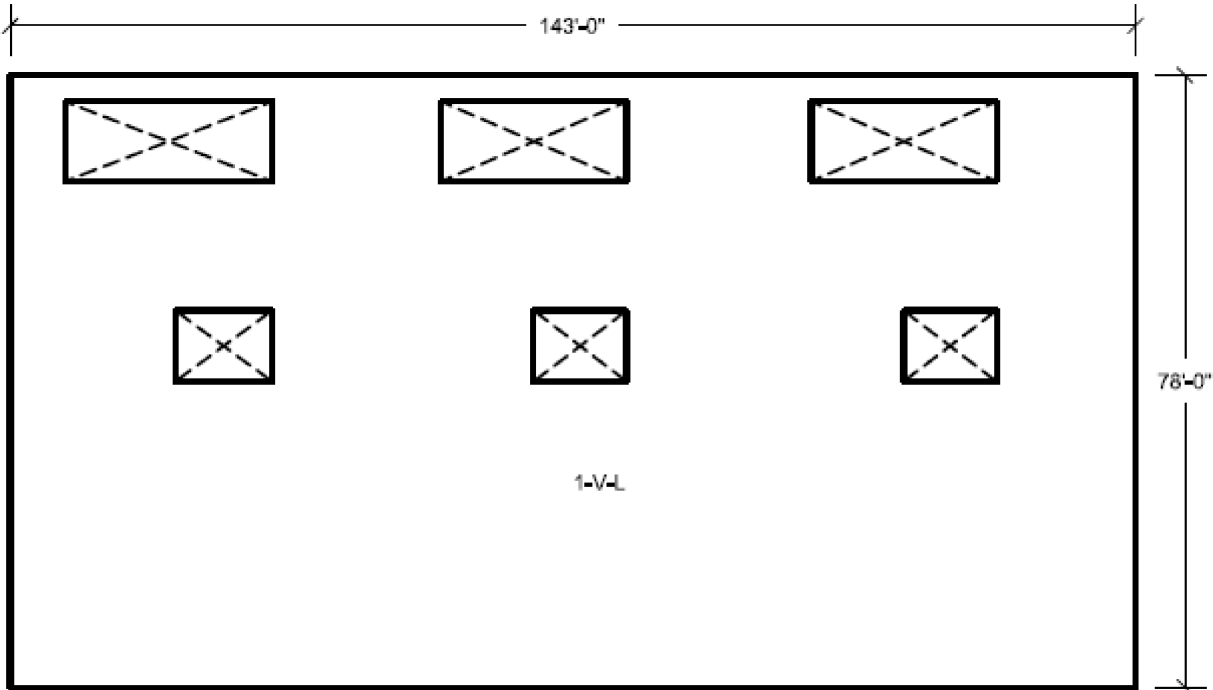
H.6-136C Pump House Roof North/South Reinforcement Zones Bottom Face
